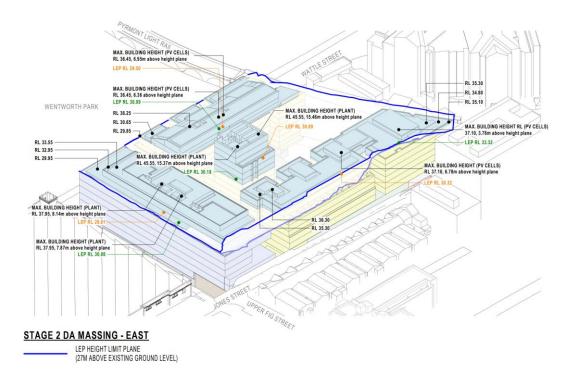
Extract LEP height limit plane (27 metres above existing ground level) – east view (Source: BVN)
